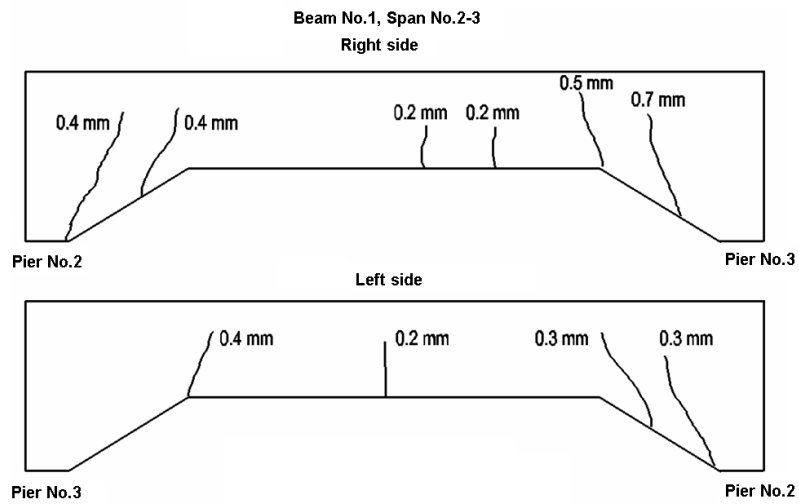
Position and width of shear and flexure cracks on beams
